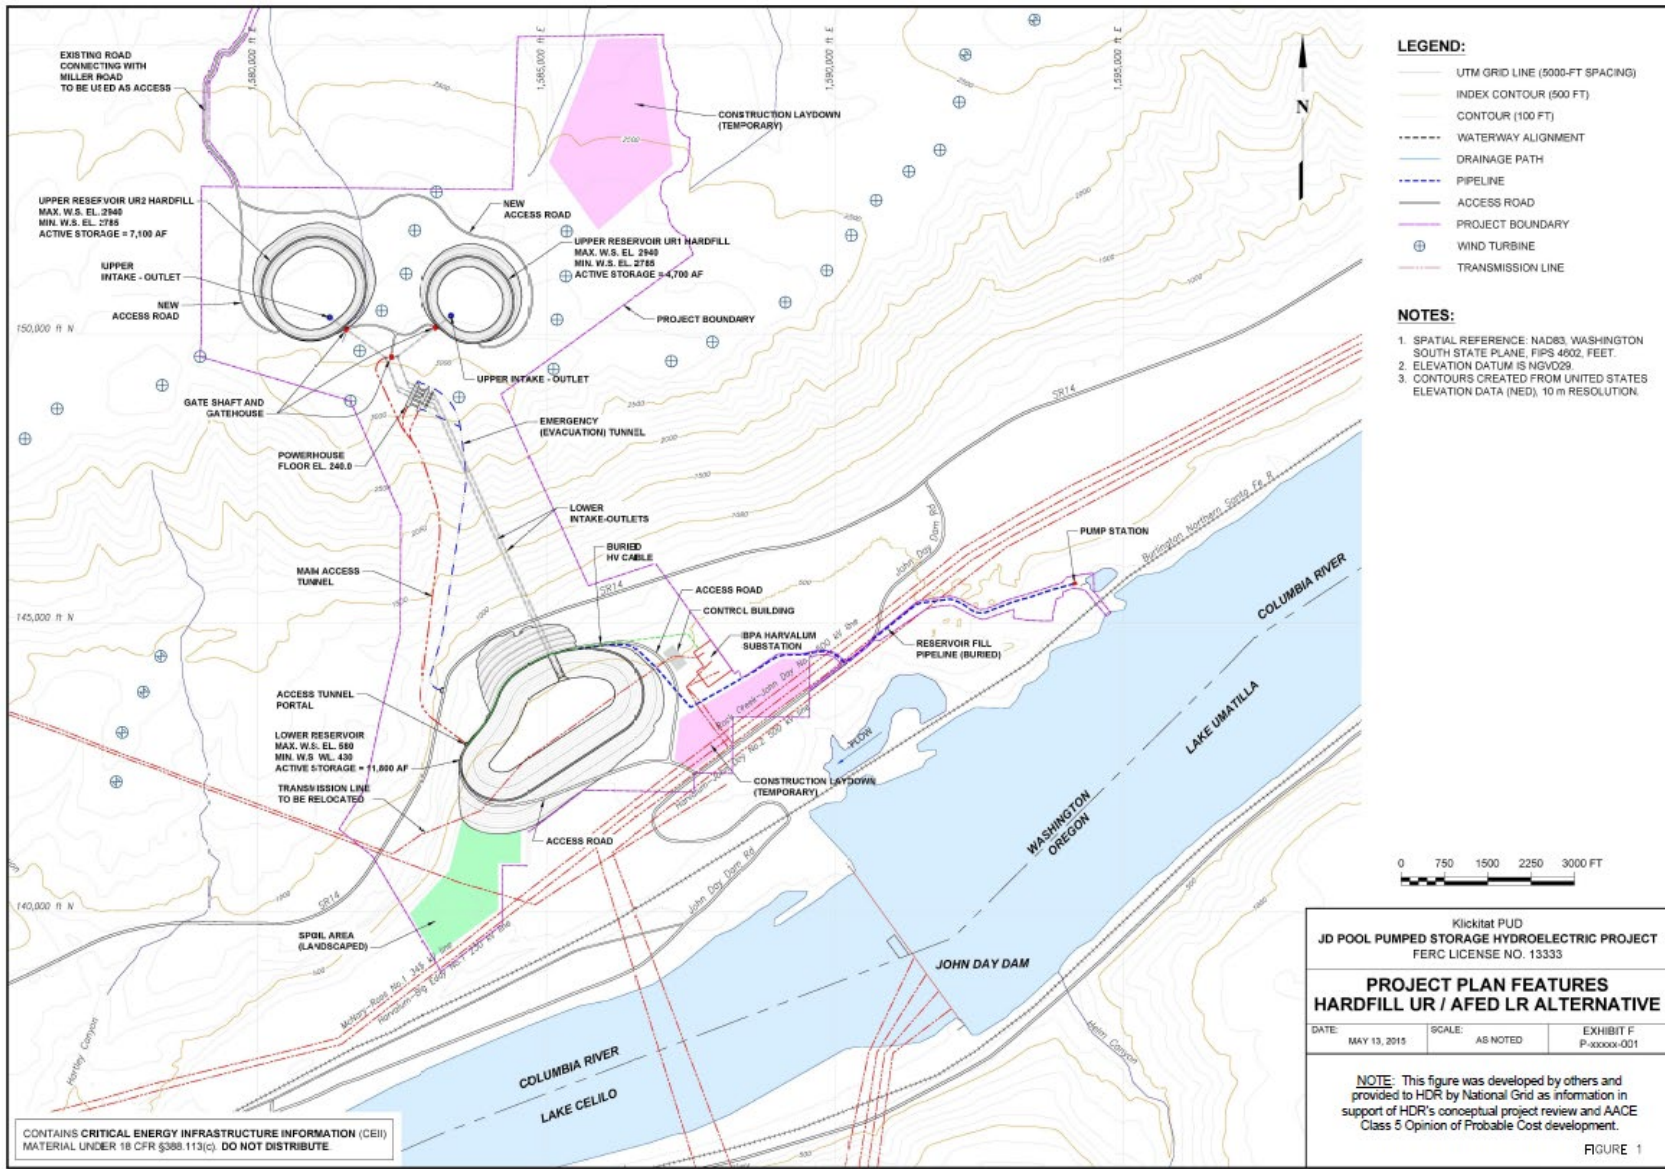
Previous Design Alternative Project General Arrangement—Plan
